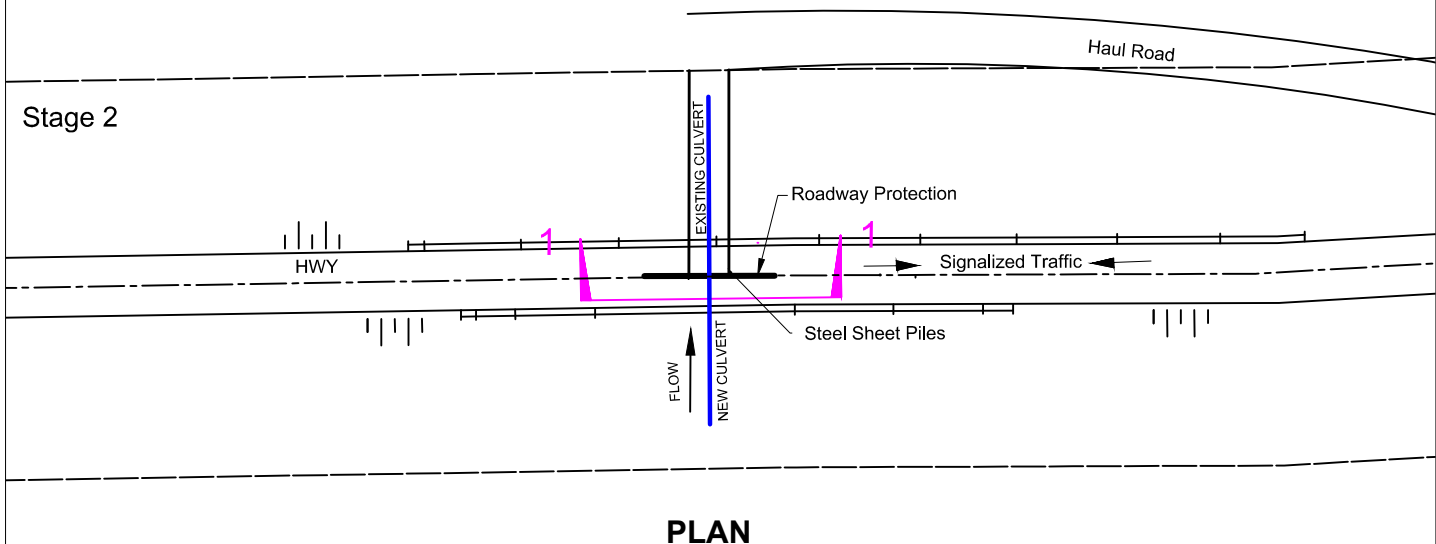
C: HALF AND HALF CONSTRUCTION WITH INSTALLATION OF STEEL SHEET PILE ABUTMENTS WITH PRECAST CONCRETE DECK (OPTION 3.C)
